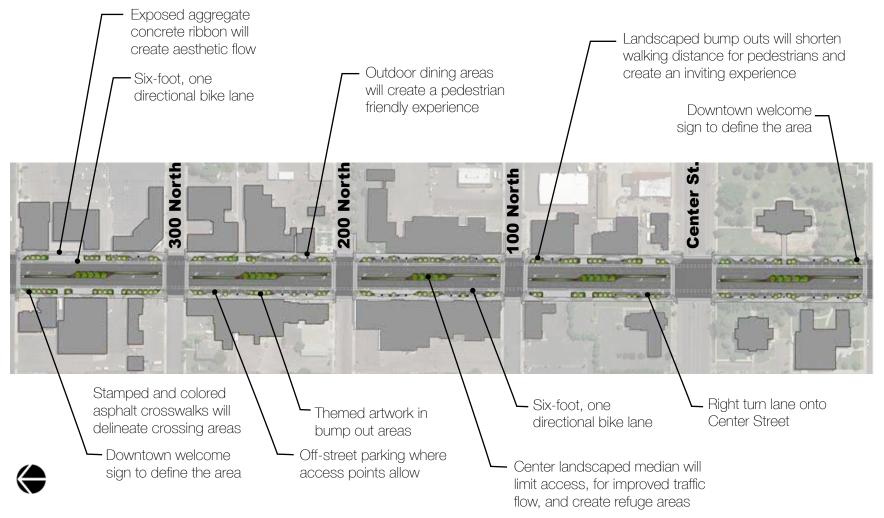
The Downtown Core will set the design standard for the Main Street cooridor. Ligthing, landscaping, hardscape, and other design elements will be reflected throughout the cooridor creating a sense of place.
